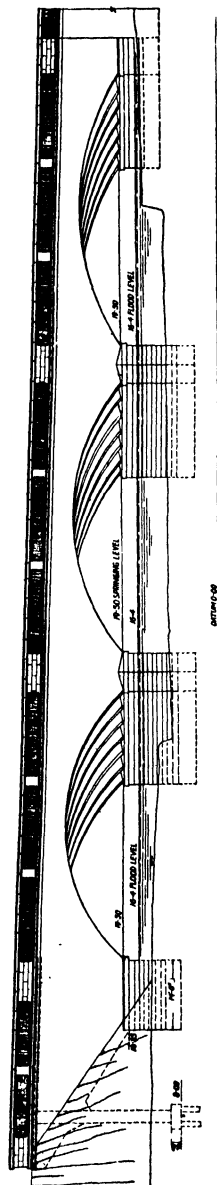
DOWNSTREAM ELEVATION, ELLON BRIDGE.
